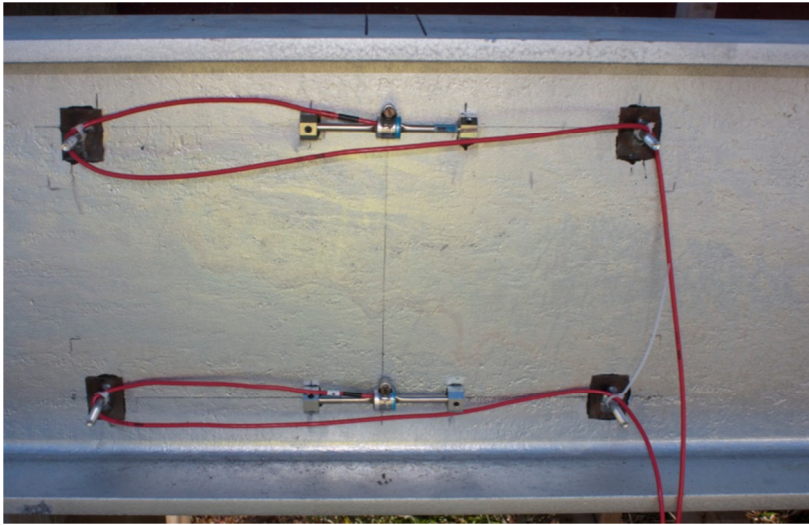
Photograph of Installed 4000 Model Vibrating Wire Gauges on Beam C
